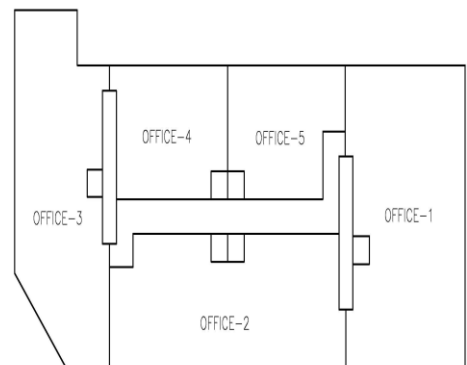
Floor Plan of Second Floor (with units as zones).
